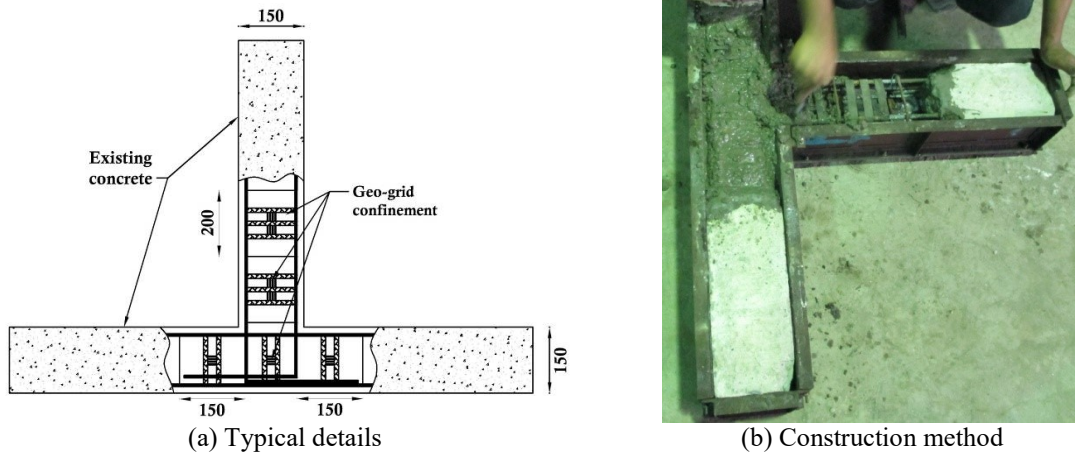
Detailed configuration of retrofitted beam-column joint
